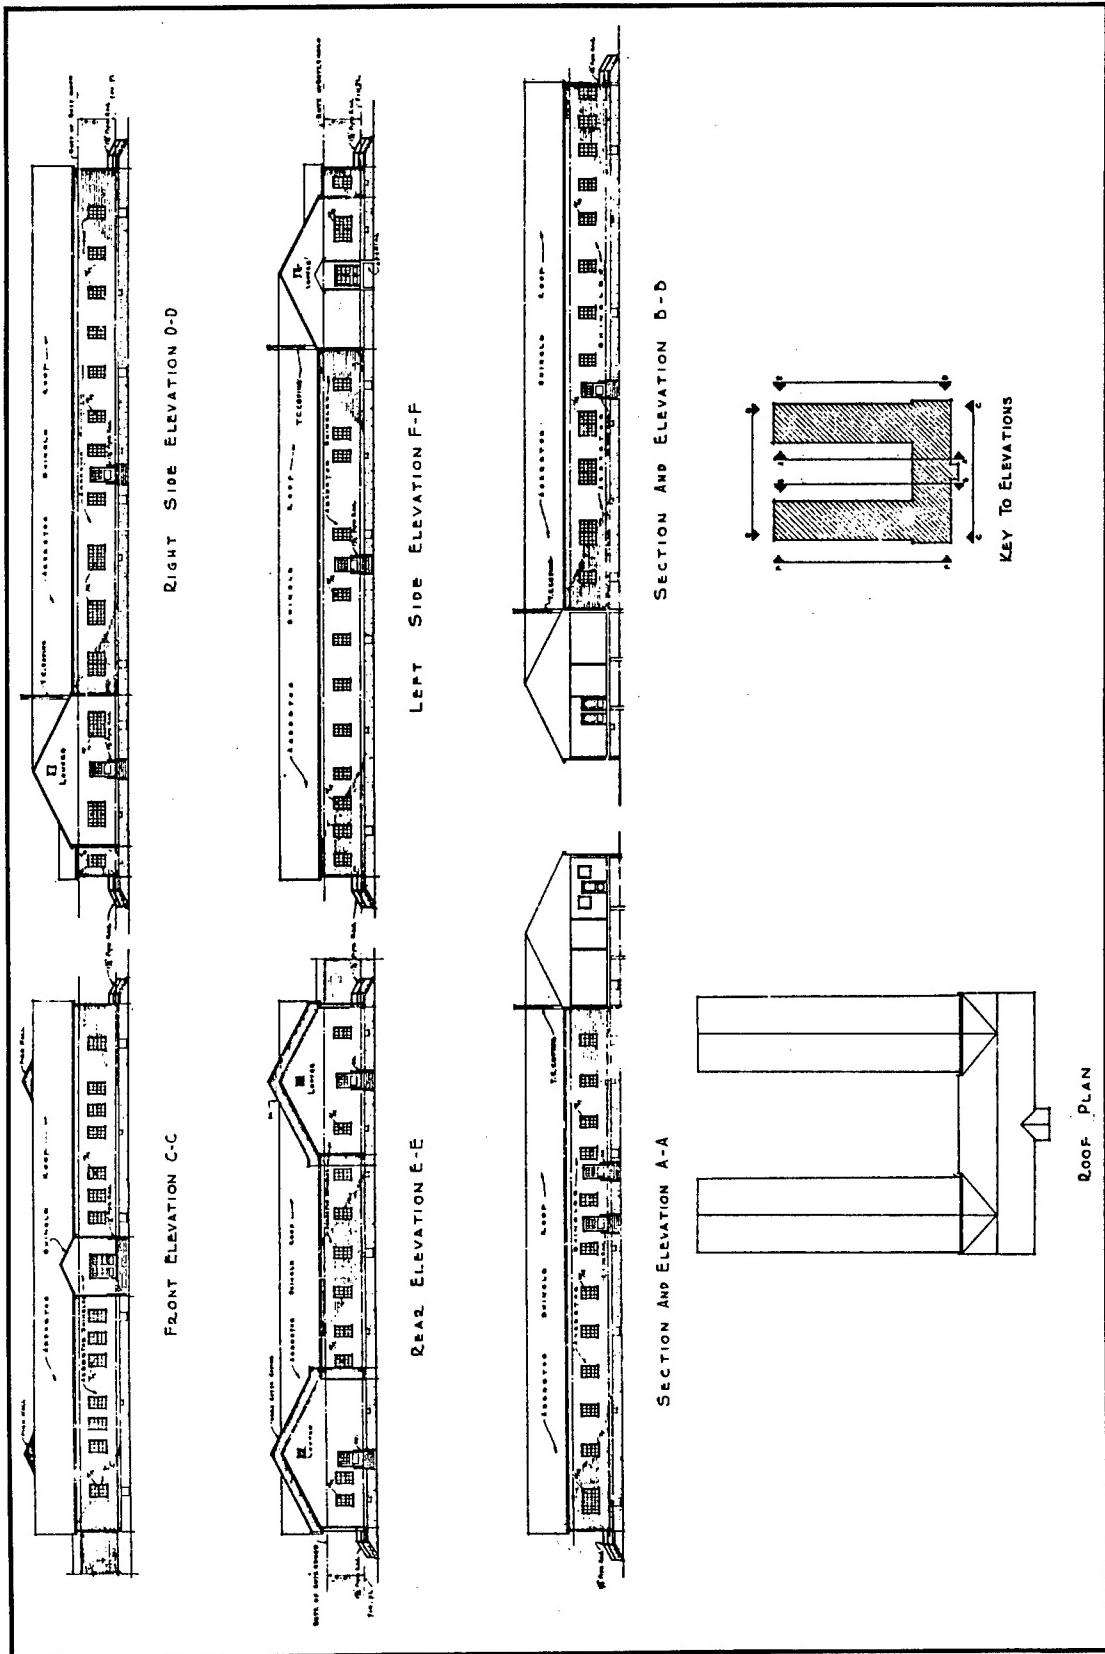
Elevation, Employment Building (Building 2511), Hoosier Ordnance Plant (INAAP Drawing 7020-182).
